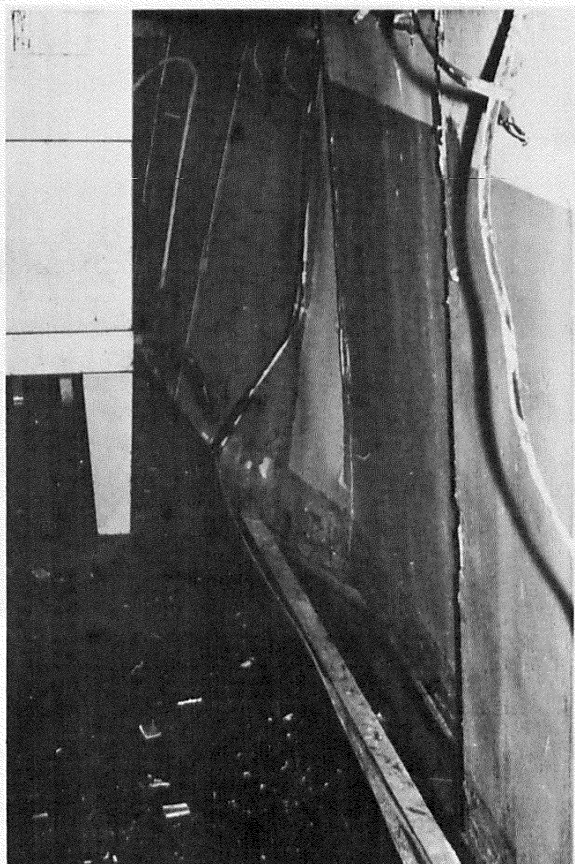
Ceiling joists pushed downward by snow encroachment upon mess hall roof.
